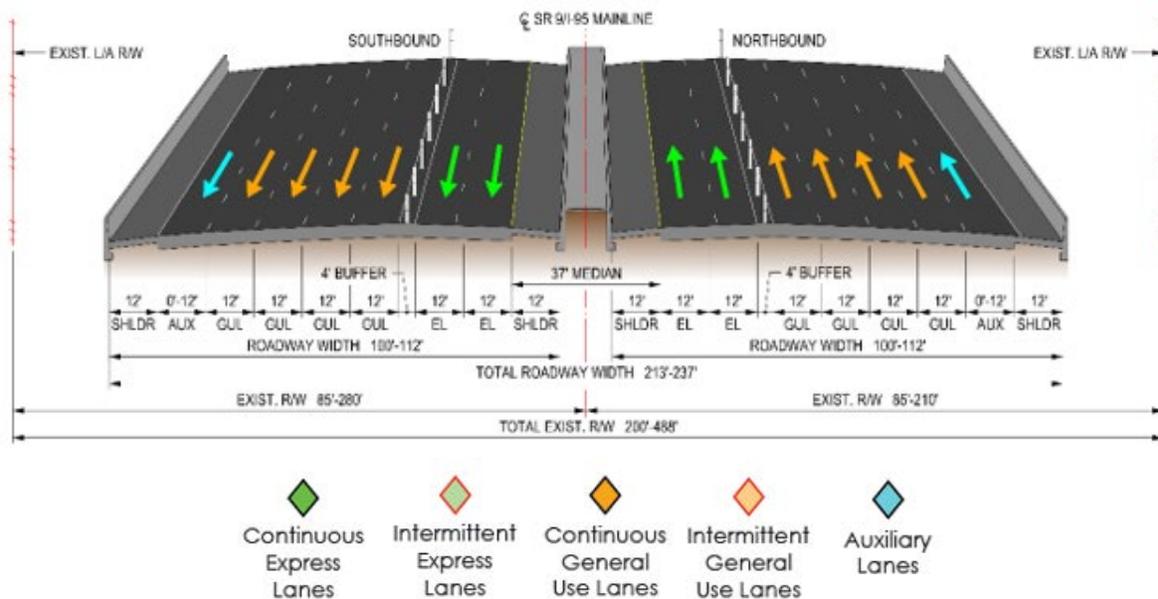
1: Proposed Typical Section - Alternative 1 - SR 9/I-95 Mainline and Express Lanes
